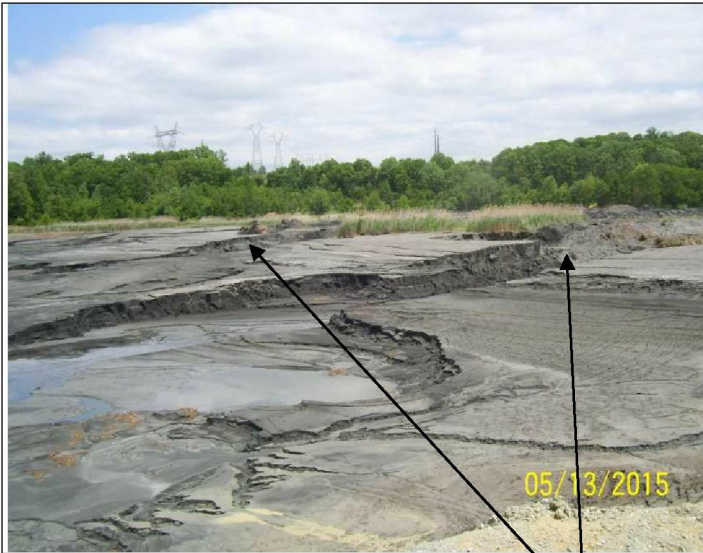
Dewatered Ash Pond E with dewatering trenches.
